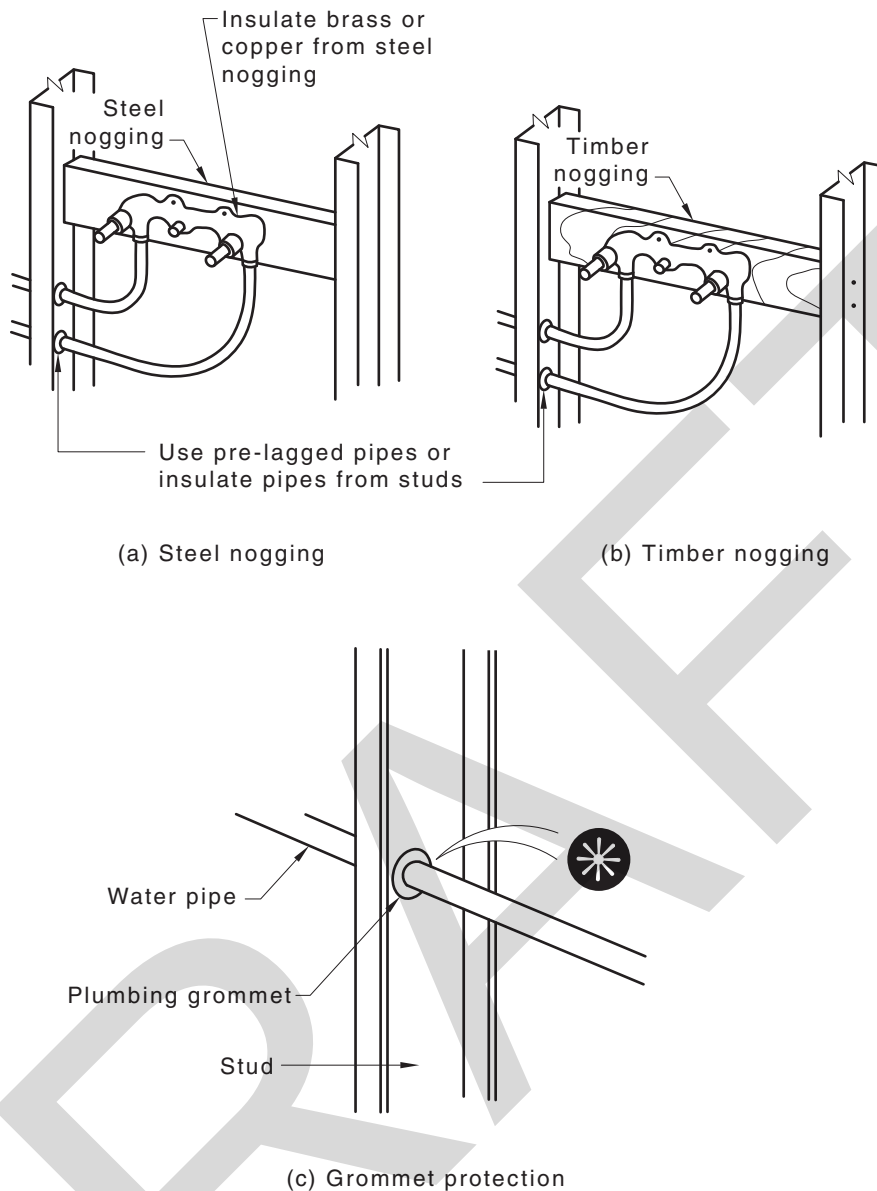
(D) INSTALLATION AND FIXING OF SERVICES
